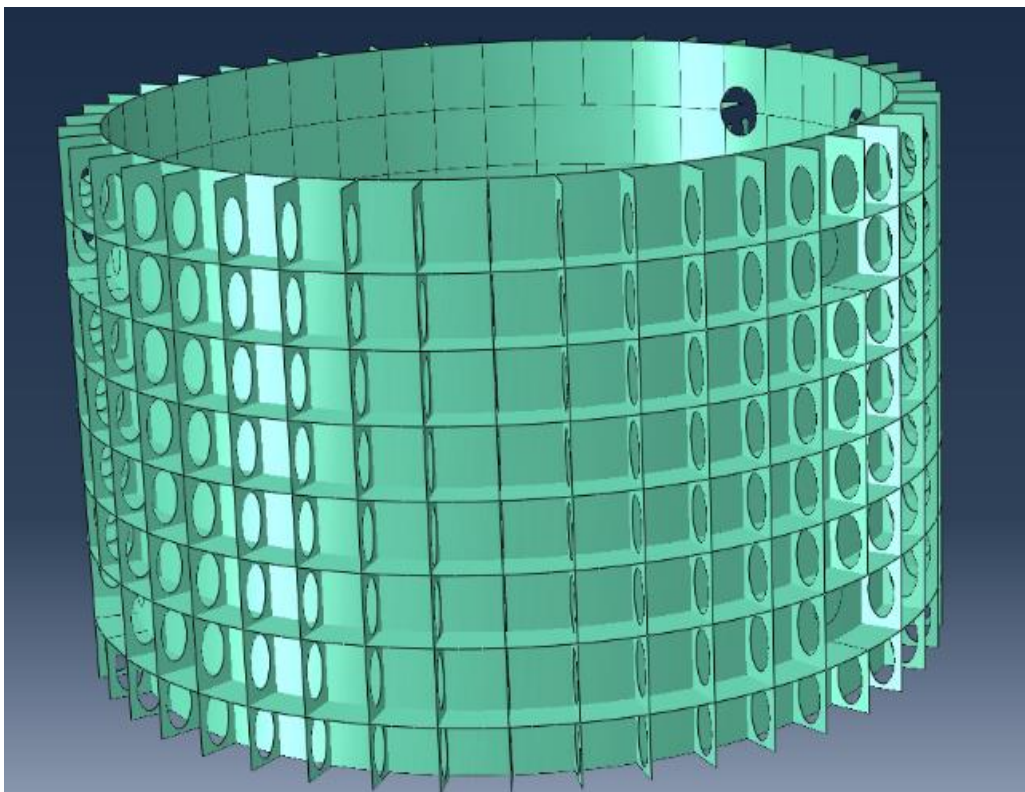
Inner surface of OWC chambers along with horizontal and vertical stiffeners
